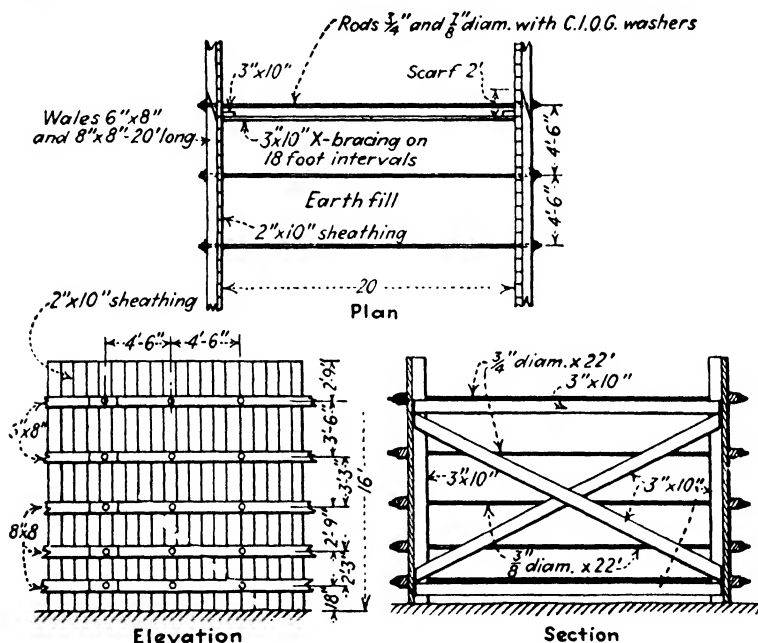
Design details of Ohio River-type cofferdam at Wheeler Dam.
